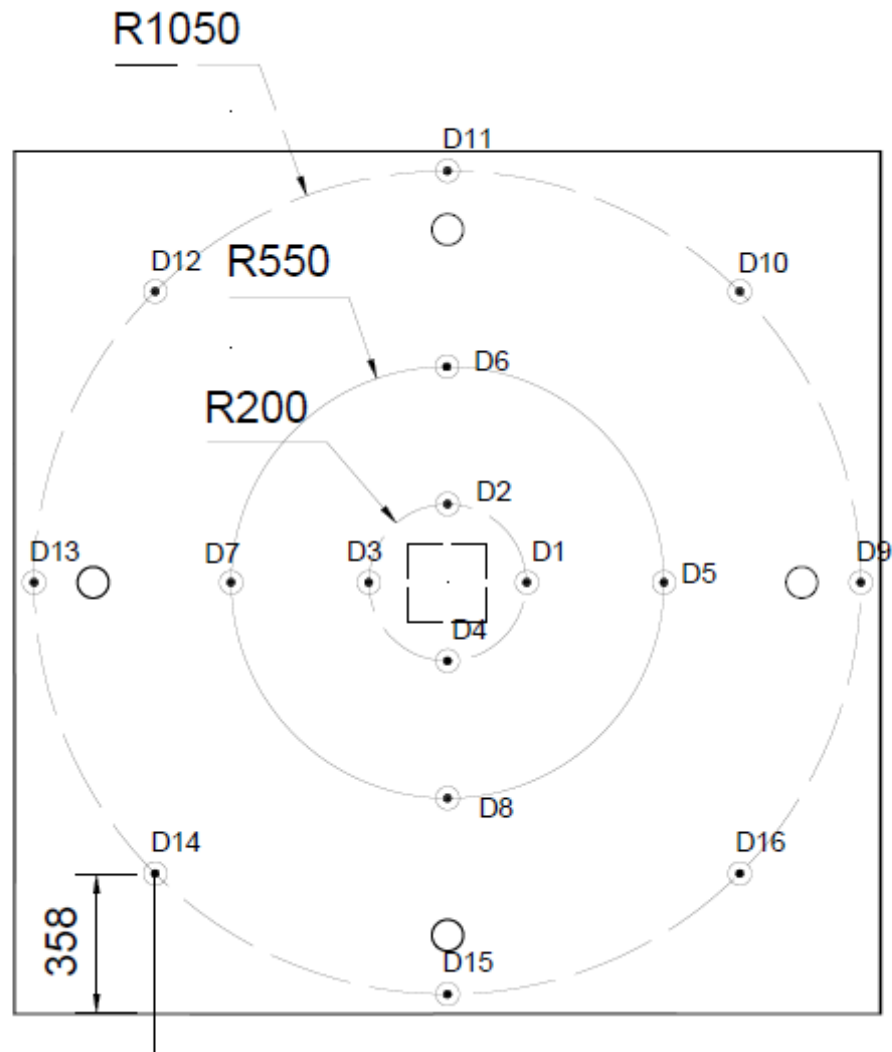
Typical positions and labels of LVDTs for 10 SFRC slab specimens.
